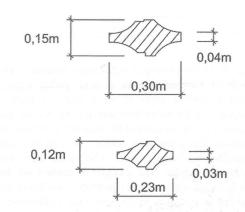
Cross-sections, top: main bar, bottom: minor bar
